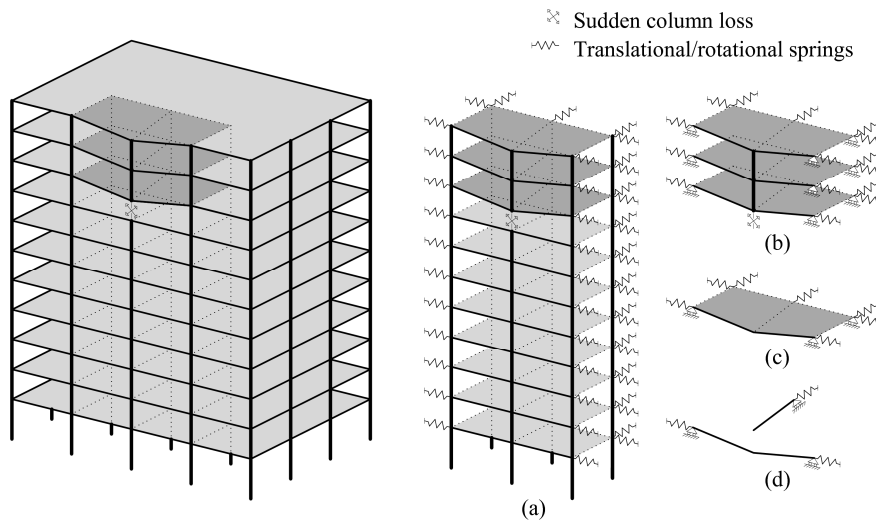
Multi-storey building subject to sudden column loss: levels of structural idealisation
